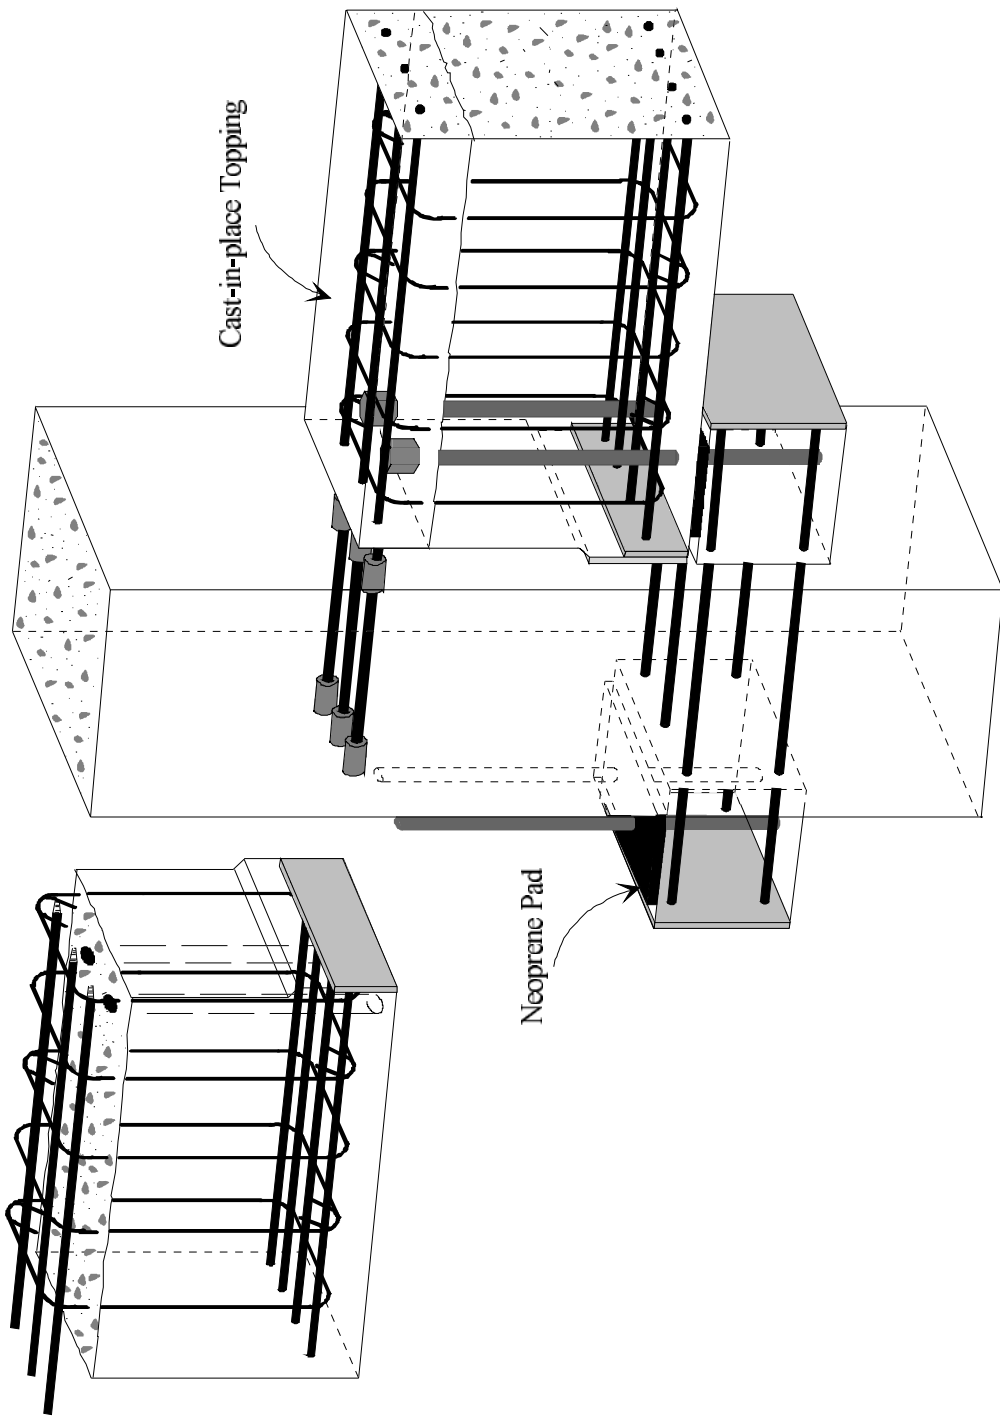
Schematic of Concrete Connection Concept Elements for Specimen F1-C
